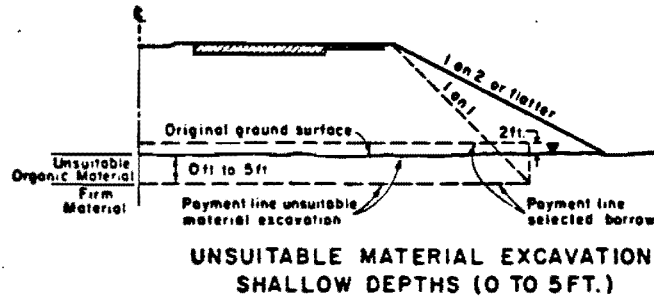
Typical sections for excavation of unsuitable material (from Ref 11).
